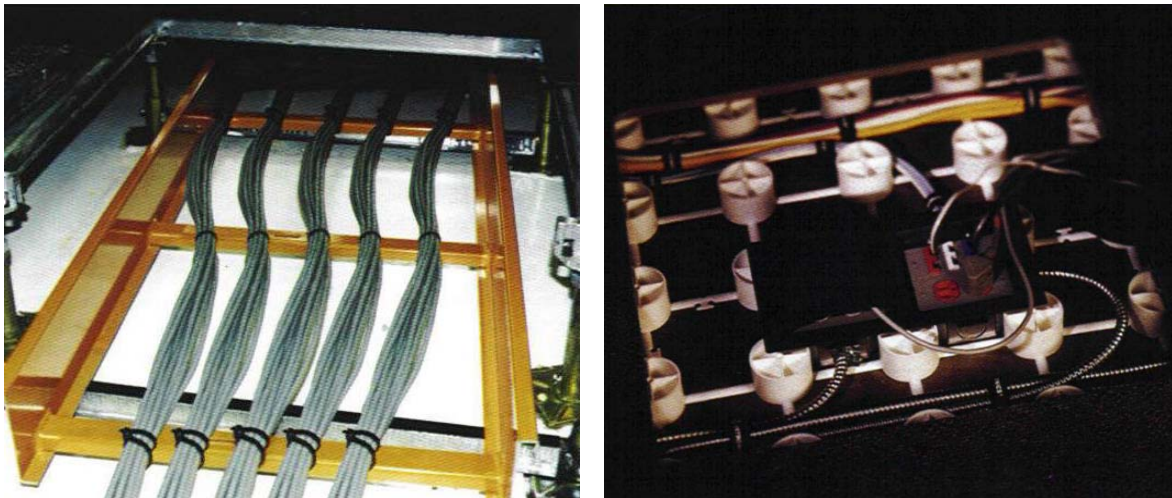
Cablefloor has a much lower height requirement (68mm). There are many different cabling systems available in South Africa.
